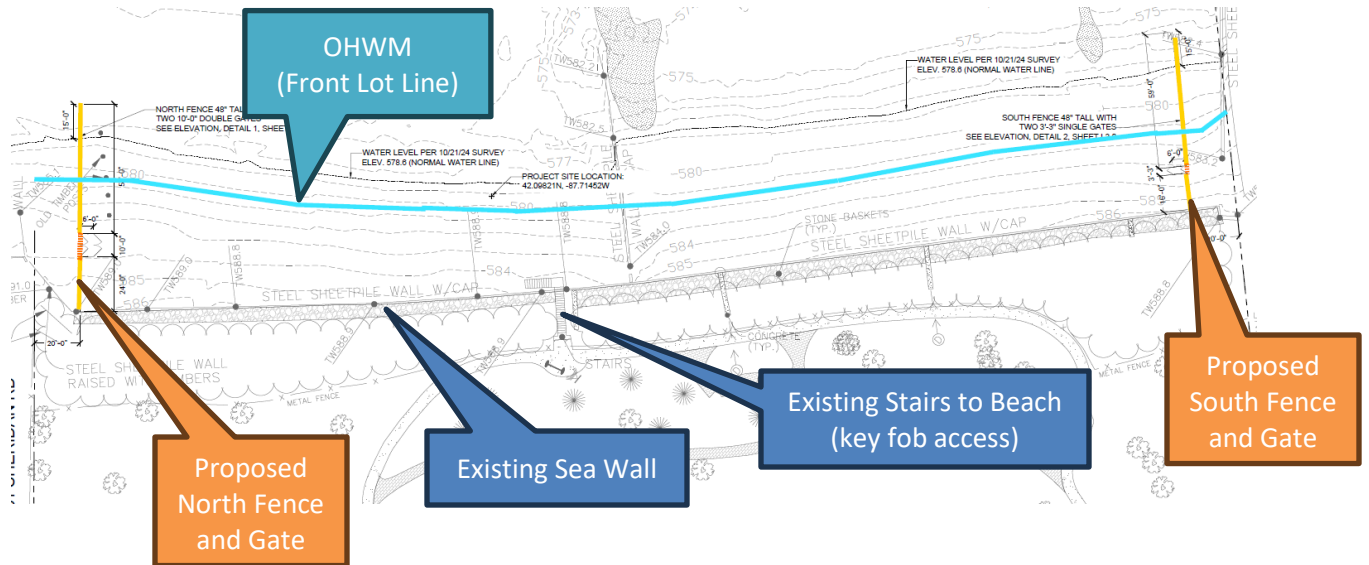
Original Site Fencing Plan (January Plan Commission Meeting)
